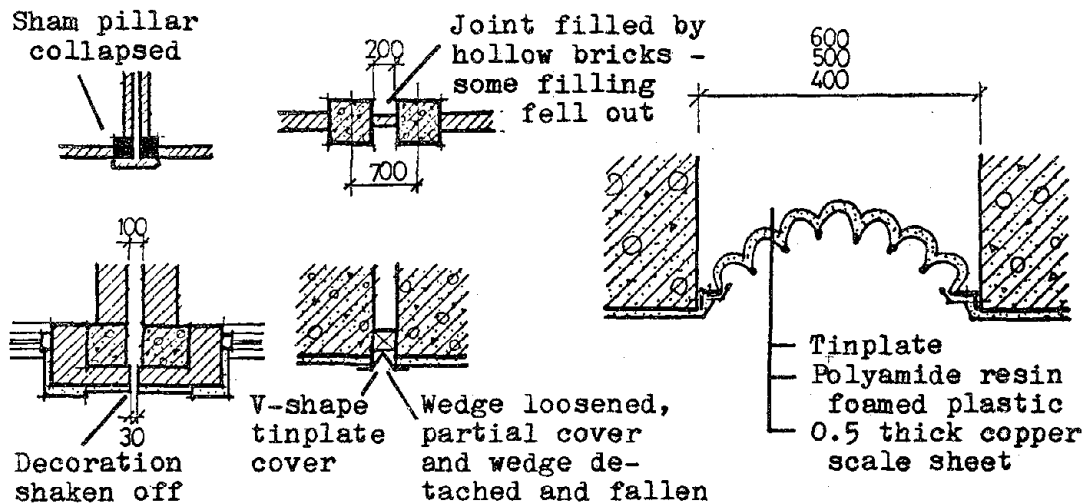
Damage condition at exterior wall deformation joint (Upper left: covering of joint; Lower left: small joint; upper & lower right: stuffing of joints)
